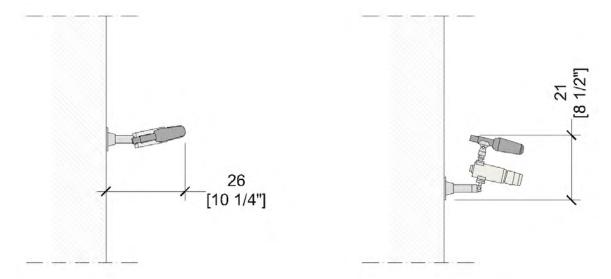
Live View Camera Wall Mount (Plan and Side View)
